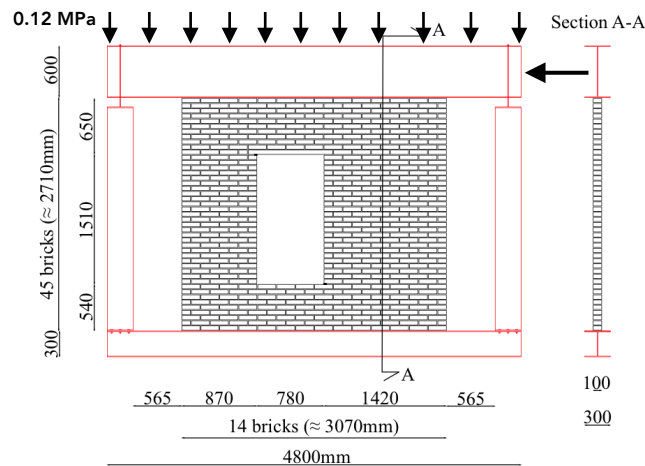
(1.1) Dimensions of the in-plane solid clay wall with asymmetric window opening.
